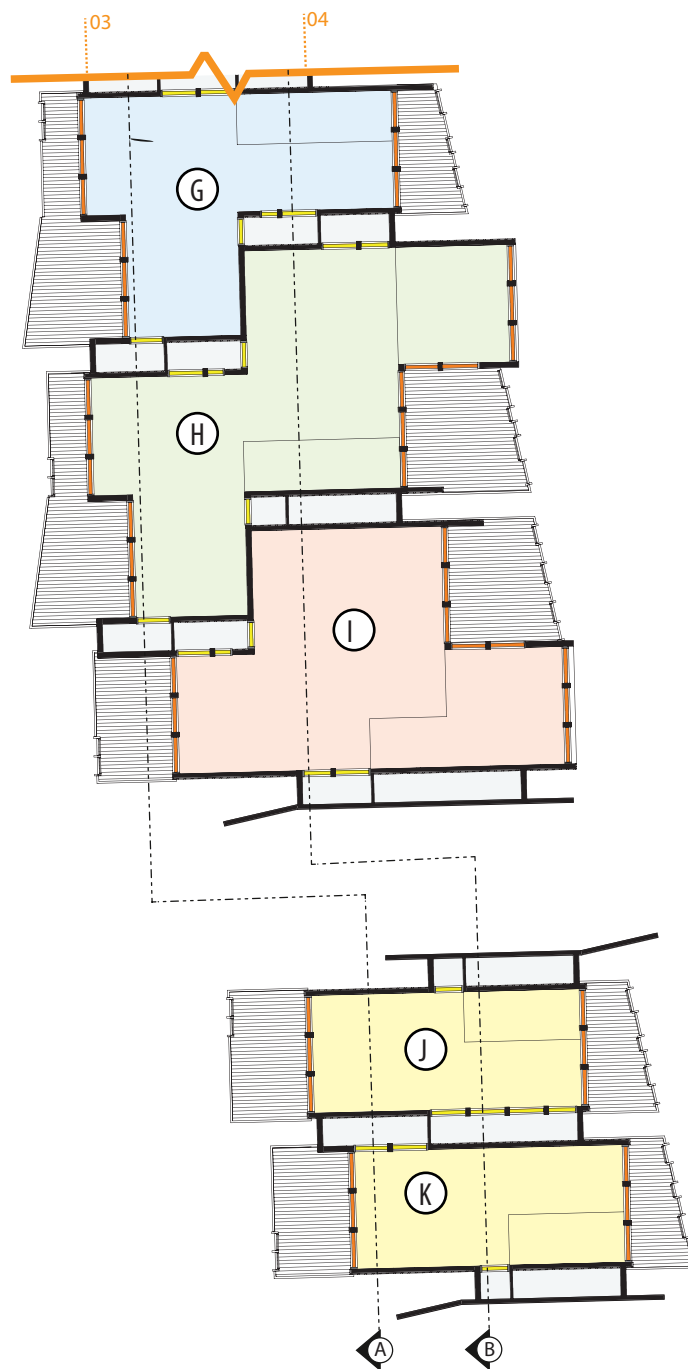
// First floor plans displaying the uninhabited dwellings G-K.
